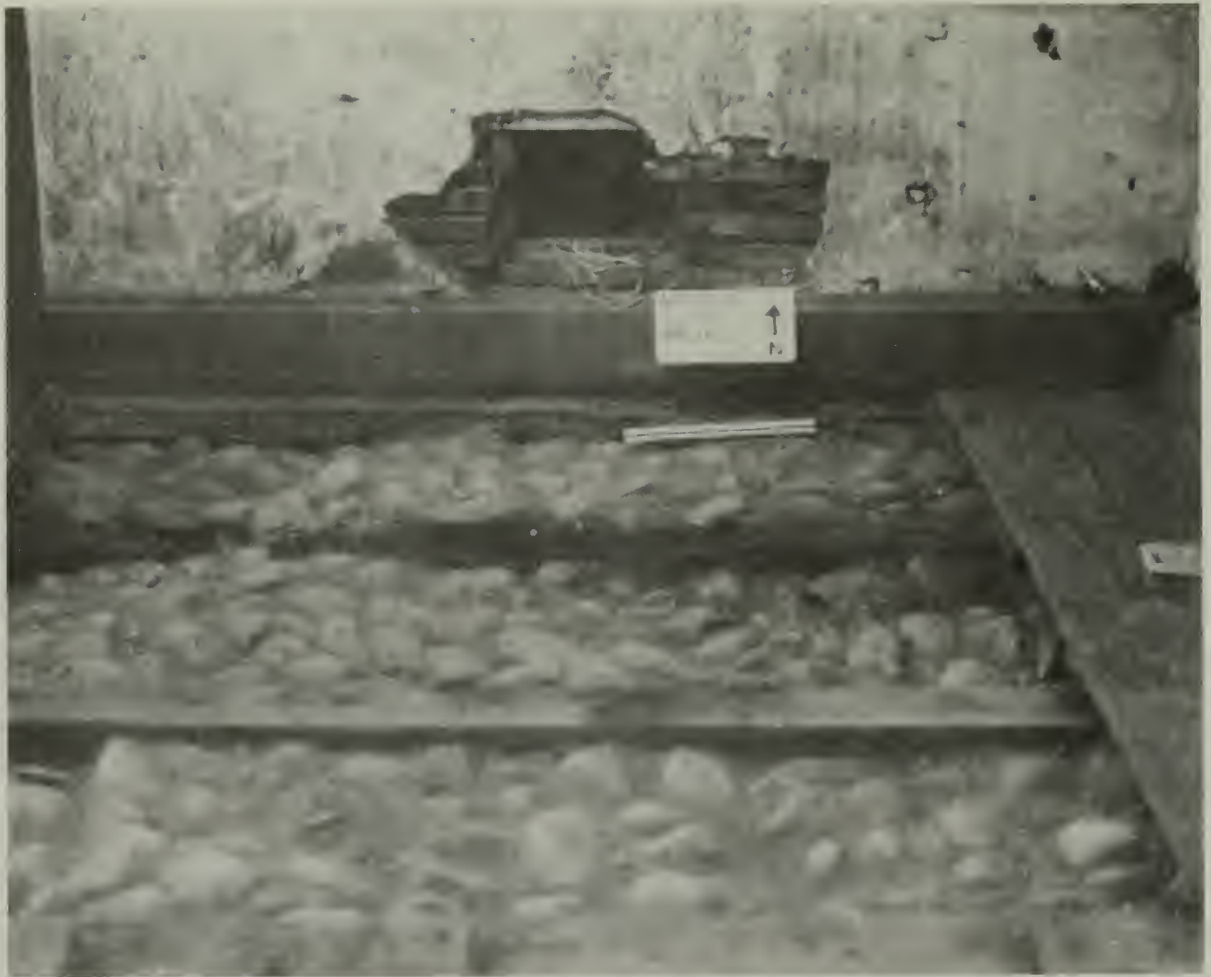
Floor and subfloor in basement room 5 (reproduced from Fiero 1983:45).
